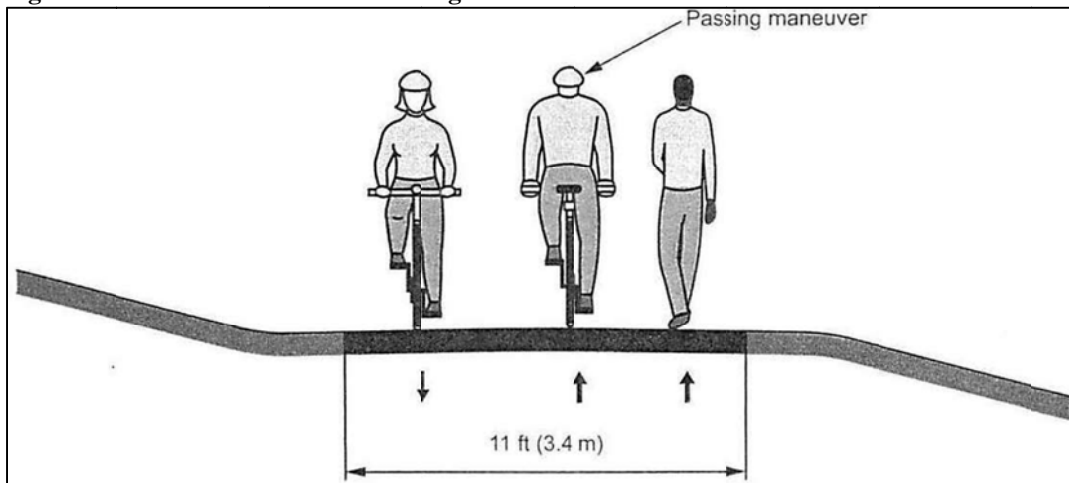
and 4.5 detail the recommended width and height characteristics in a typical cross-section and the minimum width requirements to facilitate passing.
